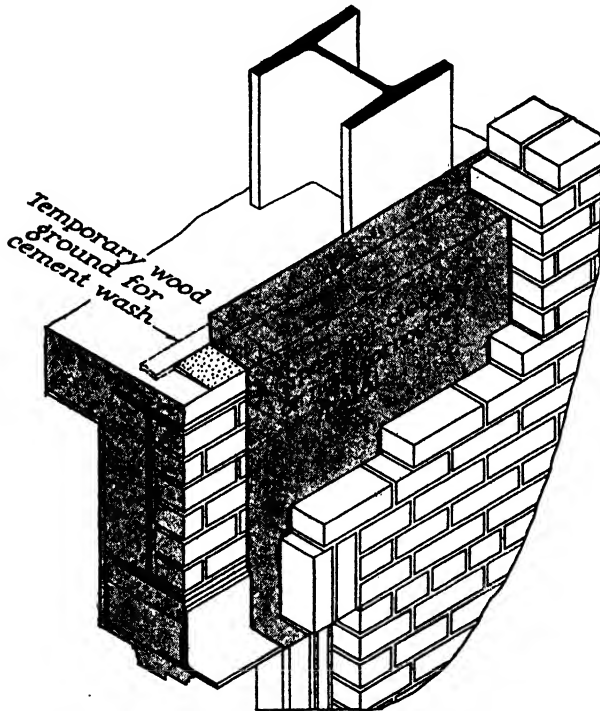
Flashing of spandrel in fireproof steel construction, showing 8 in. of brick over exterior of steel columns.
